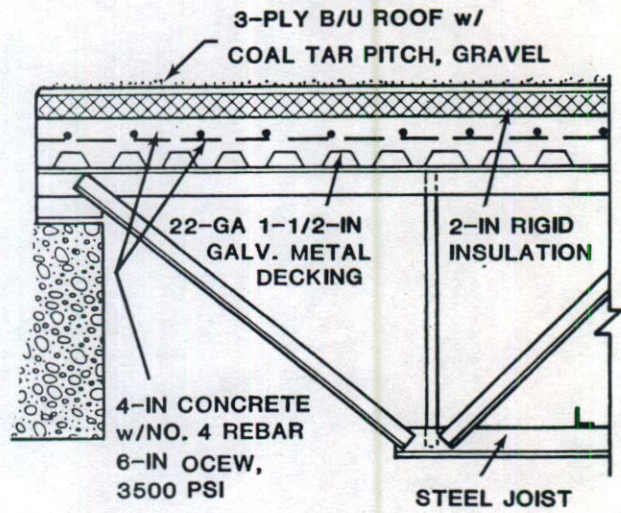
Type 2—Metal Subdeck and Reinforced Concrete
